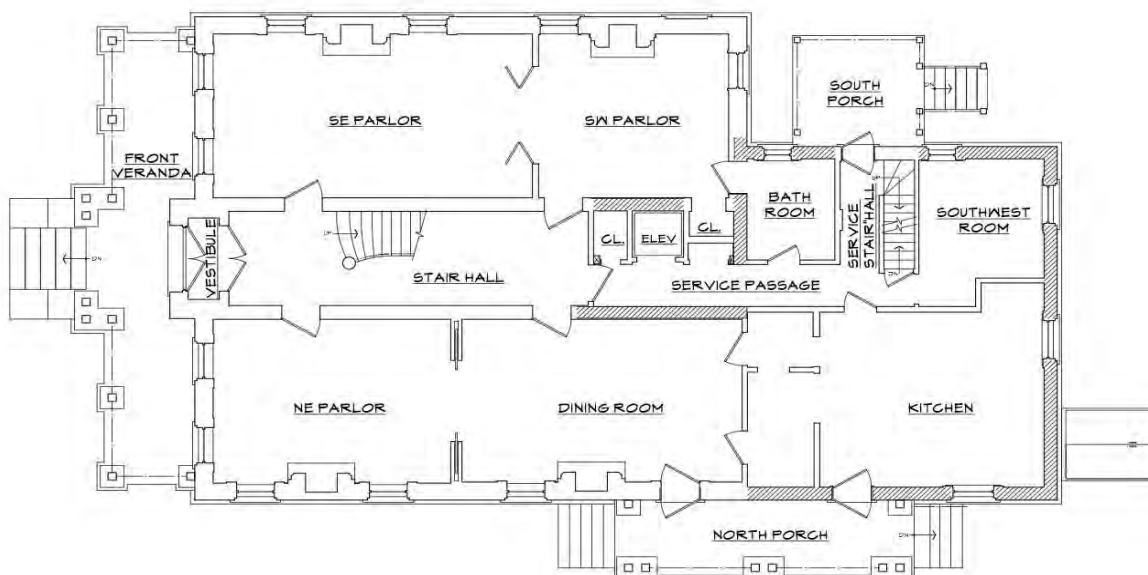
First story plan (Crawford & Stearns, Architects and Planners)
